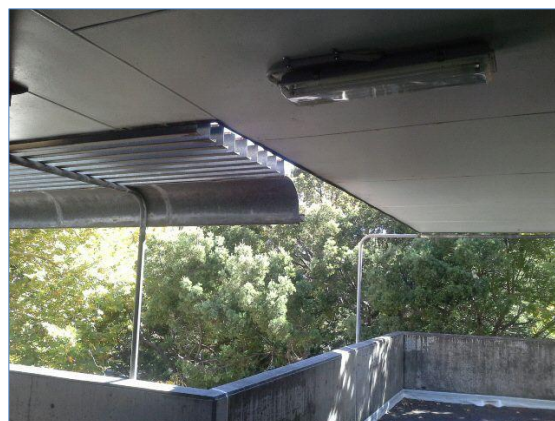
Level 3 room 3.3 - Fibre cement infill panel
